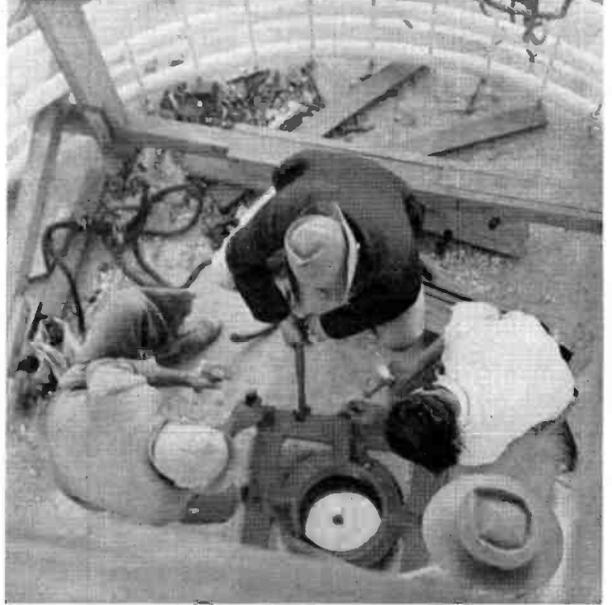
(above). In this view workmen are shown constructing a suitable base for "seating" the tower.
